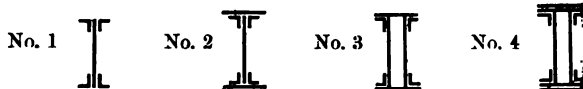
44.—SECTIONS OF GIRDERS IN TABLE 126.
